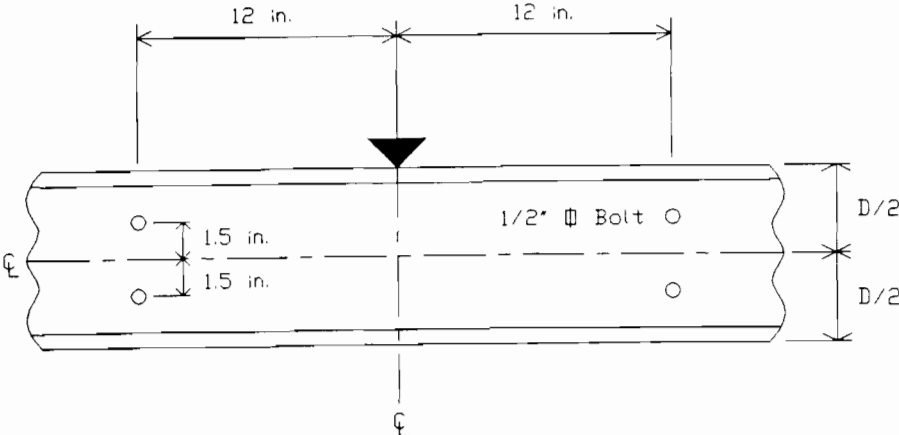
Typical Bolt Pattern for Lapped Z-Sections.
